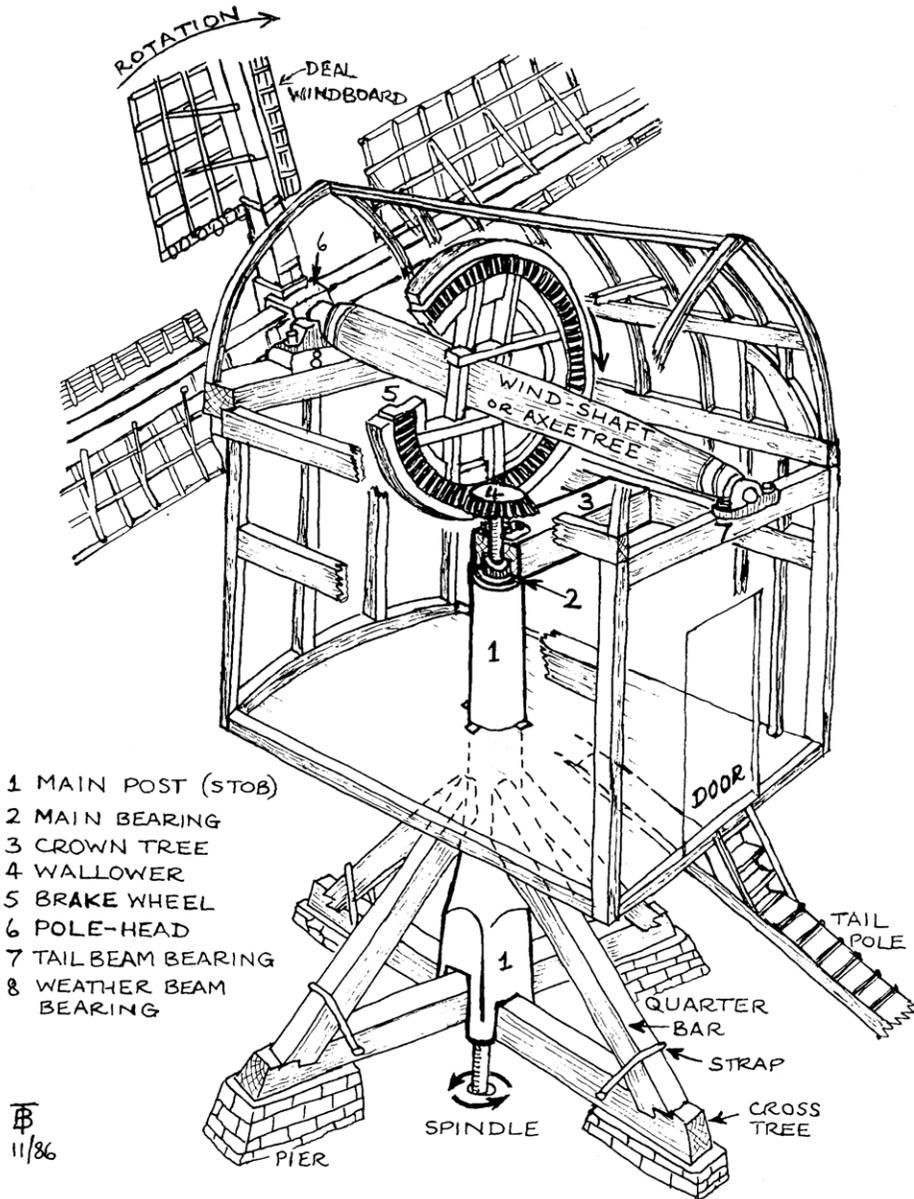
Reconstructed, cutaway outline of a four-sailed post-mill. It shows how a geared brake-wheel on the wind-shaft could rotate a wallower and a central, vertical spindle passing down the centre of the main post to drive machinery in a mine below.
